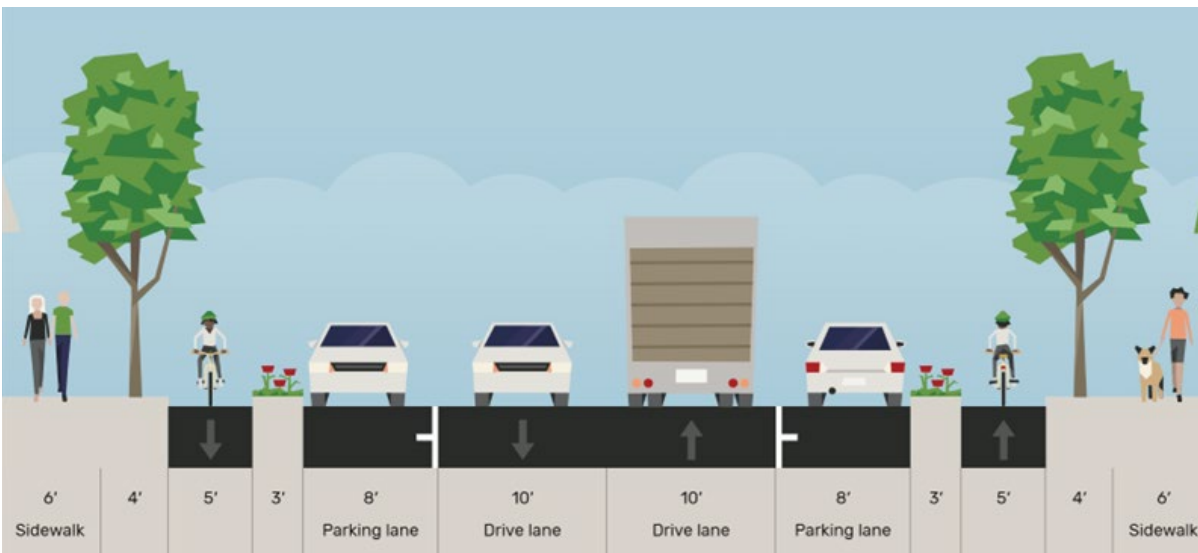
Typical street standard option for new essential streets. Some of the first new developments could make use of public funding to meet street requirements.
